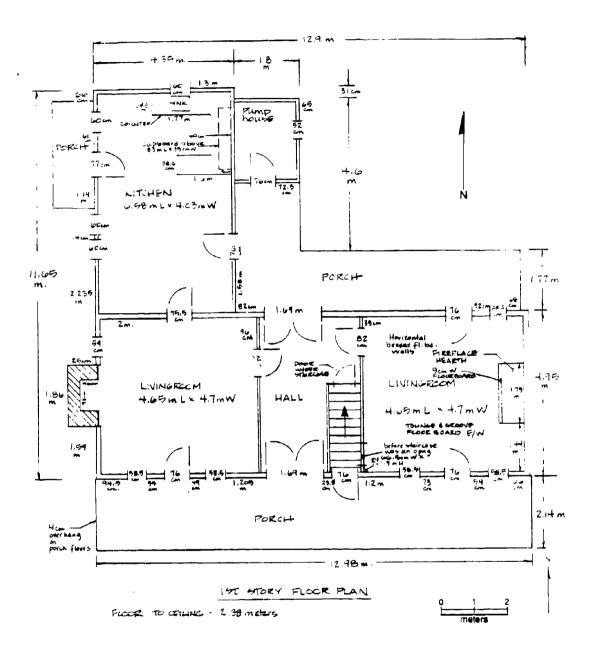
Field architectural floorplan of the first floor of the main dwelling at 41DN157.
